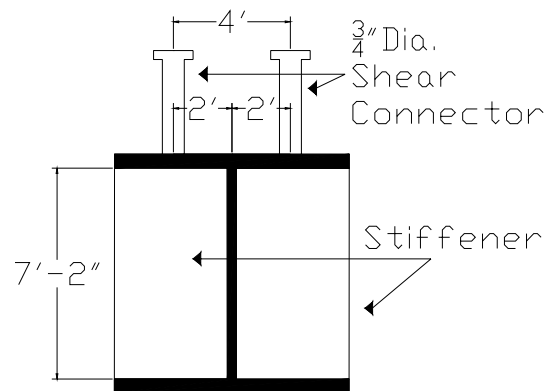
Transverse View of Test Specimen, with Shear Connector and Stiffener Dimensions
